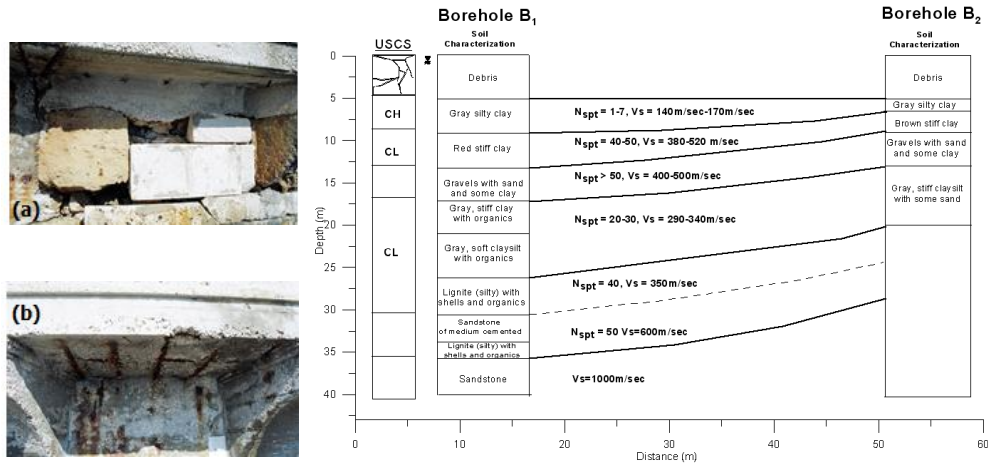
(a-b) Pre-rehabilitation state of the bridge: Major defects on stone and concrete sections of the bridge (c) 2D geotechnical cross-section and foundation soil characterization at the bridge site based on field surveys and laboratory tests.
